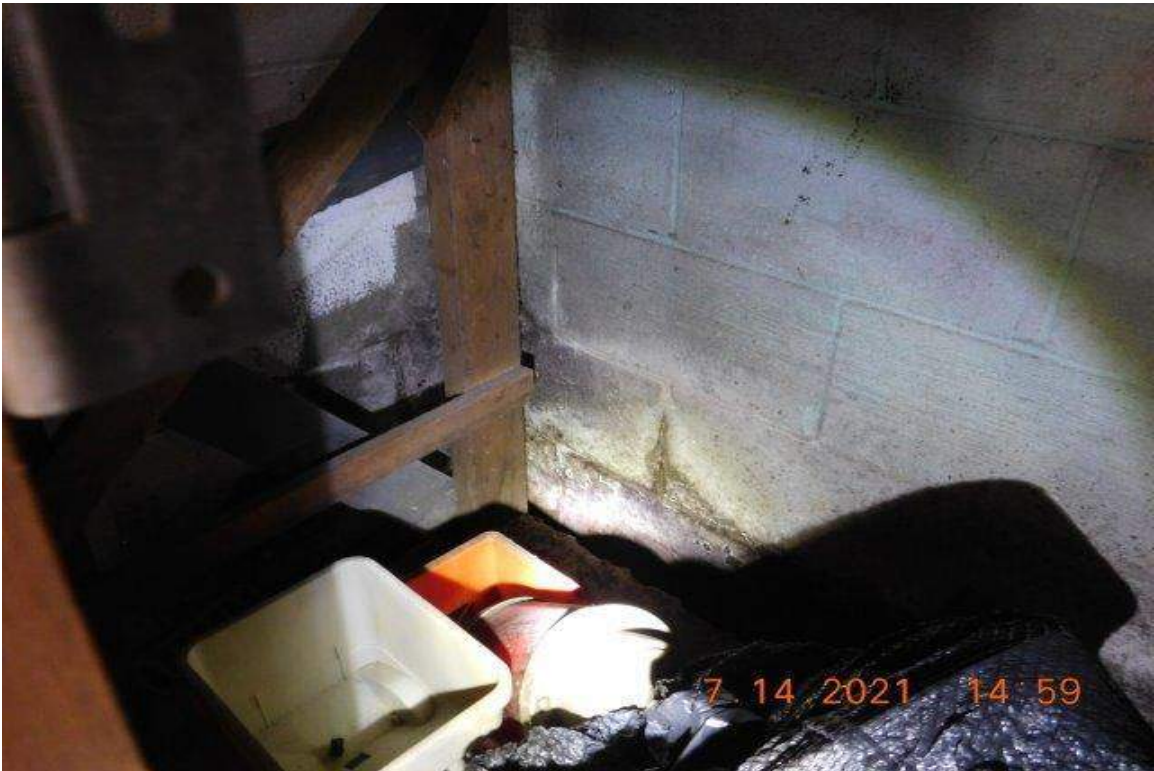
CLOSE-UP OF GARAGE REAR WALL
